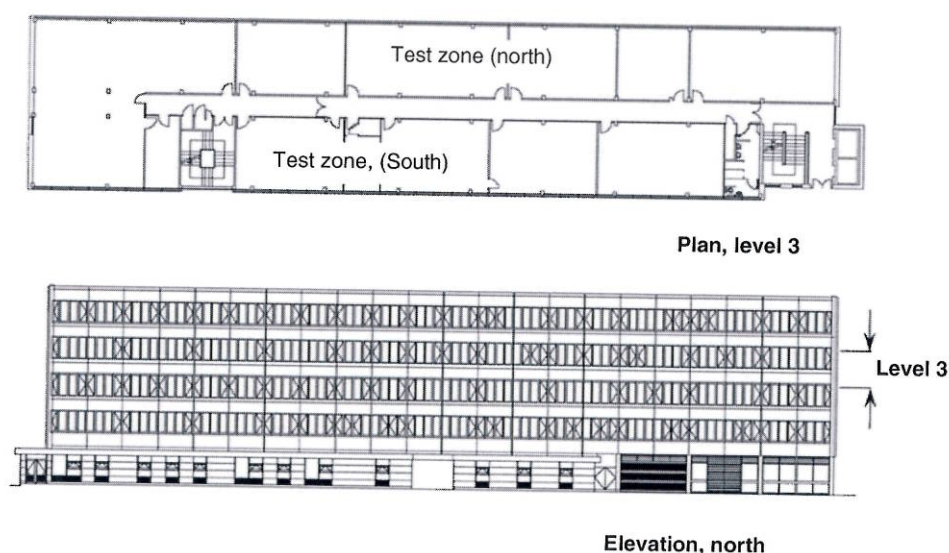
Northumberland Building (Top: Level 3 floor plan Bottom: North face elevation)
